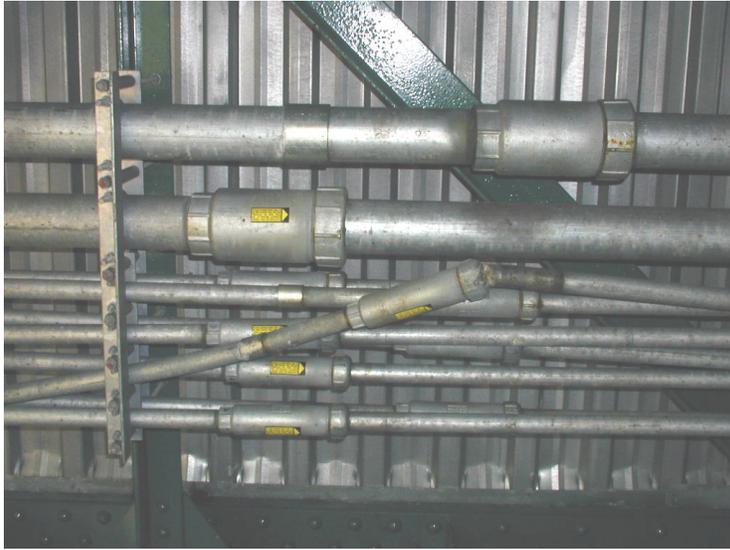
Conduit and Couplers, Span 1 – note bend in conduit, and coupler separation
